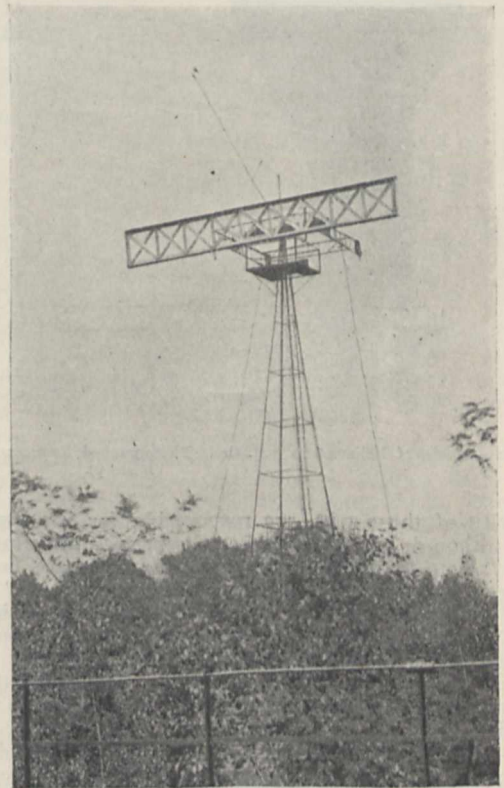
Wind Observation Tower with model girder 30 feet by 3.5 feet in position.
